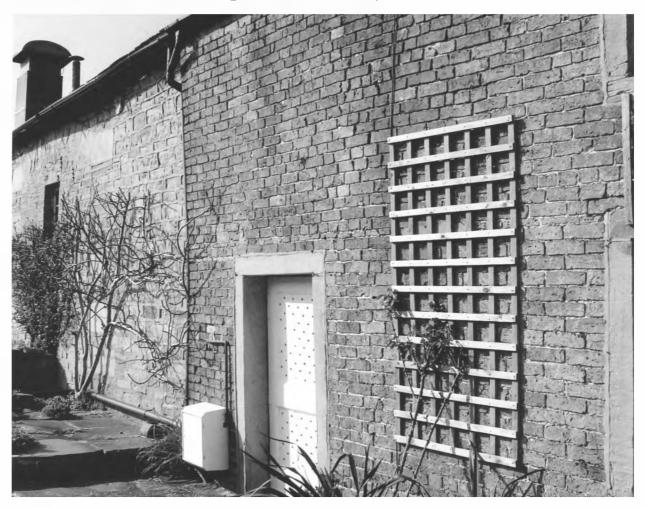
A skin of hand-moulded brick applied to a farm building in Frizinghall.
